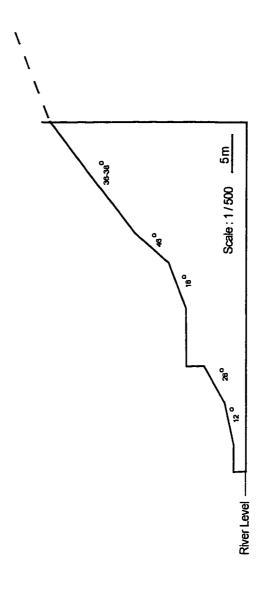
Longitudinal Profile, P-27, at Loc. 27, (looking downstream)
